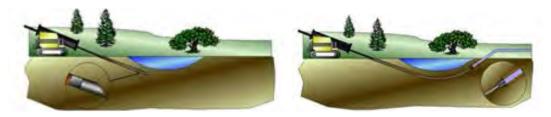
Sample image of horizontal directional drilling (Image from Underground Solutions at http://www.undergroundsolutions.com)
